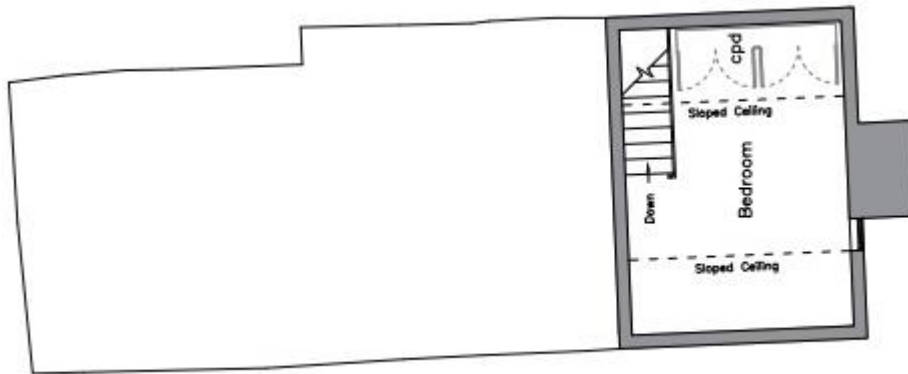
Attic plan highlighting (Gateley Smithers Purslow)
